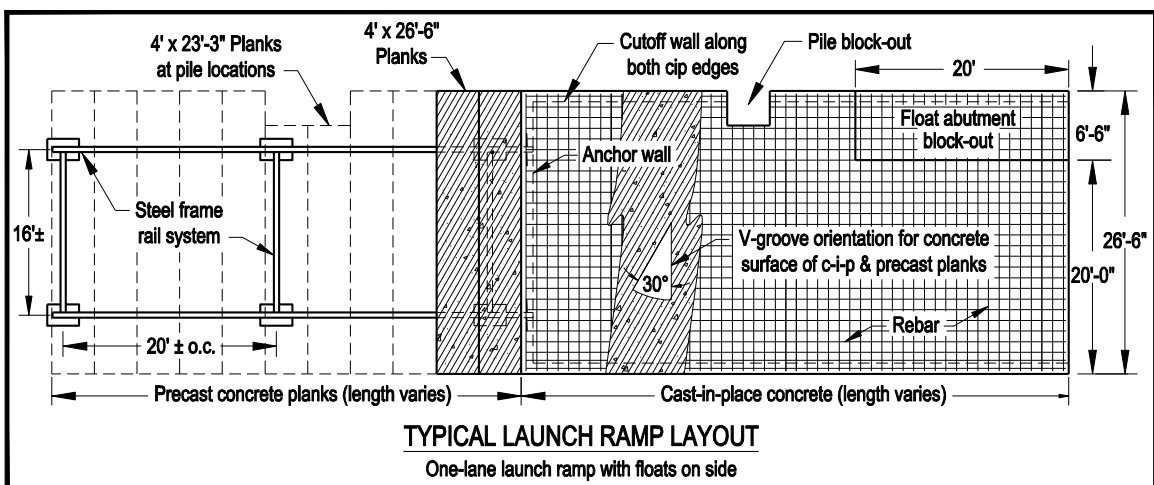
Launch ramp layout showing rebar, rails, and block-outs
